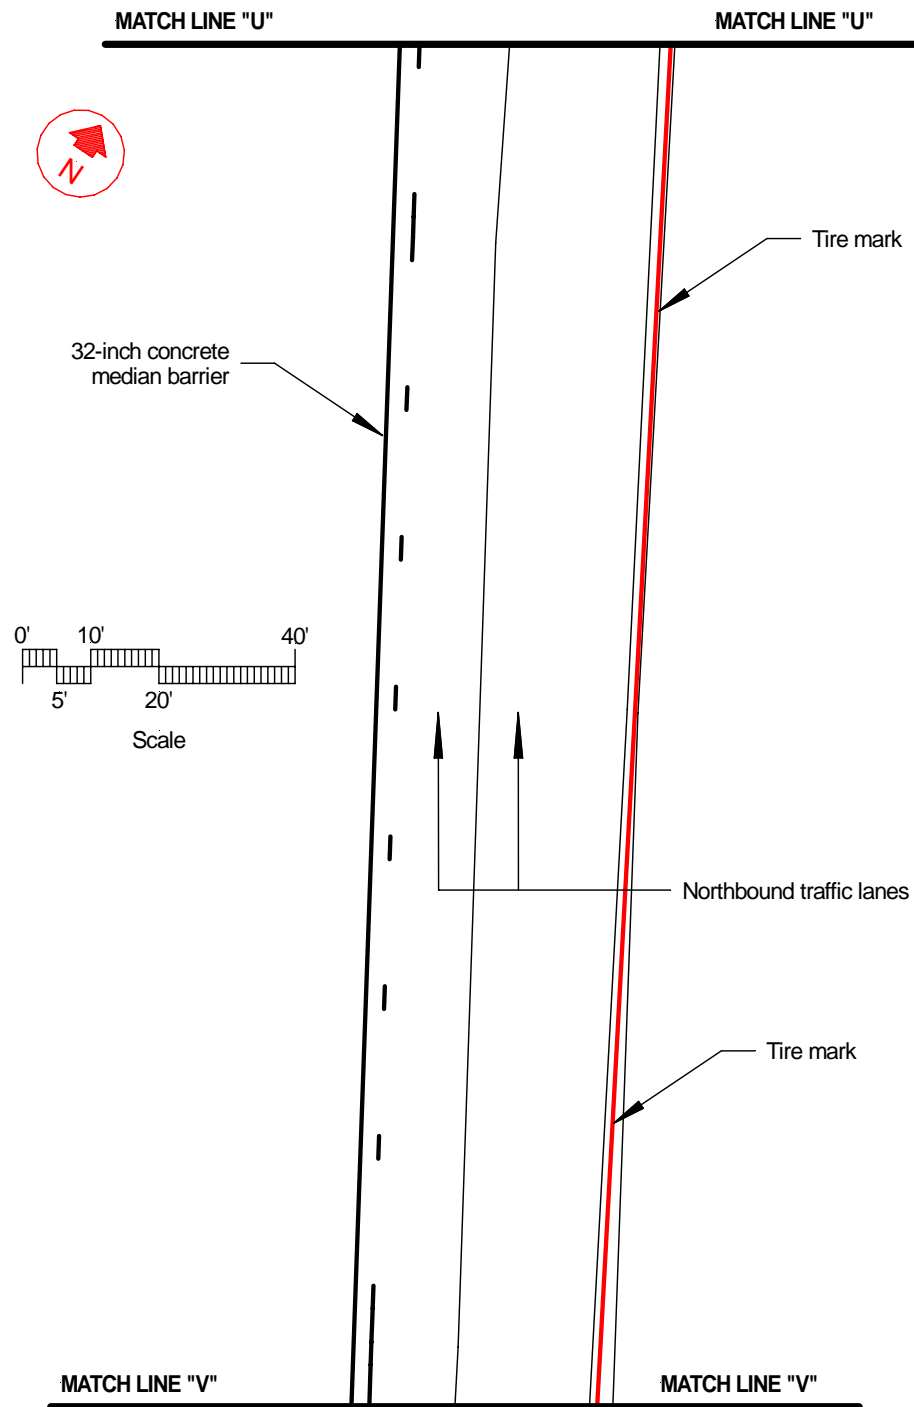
NTSB map of U-V pavement markings and roadway evidence.
